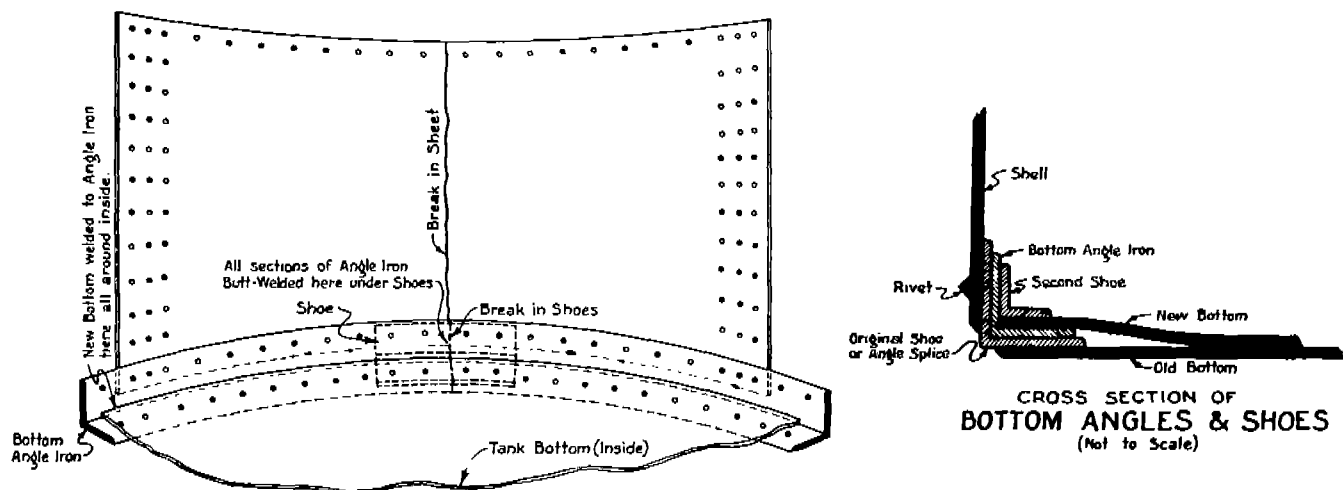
Section through double bottom, and detail of failure in 55,000-bbl riveted tank No. 2
